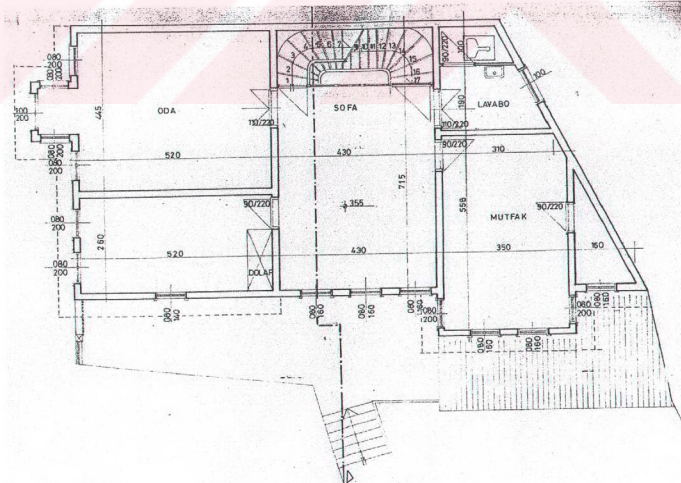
Mustafa Necip Street, No: 6, Ground Floor Plan
